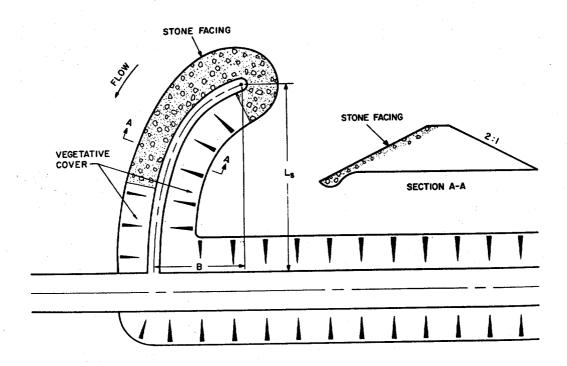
Plan and cross section of an elliptical spur dike. (From Bradley, 1973.)
